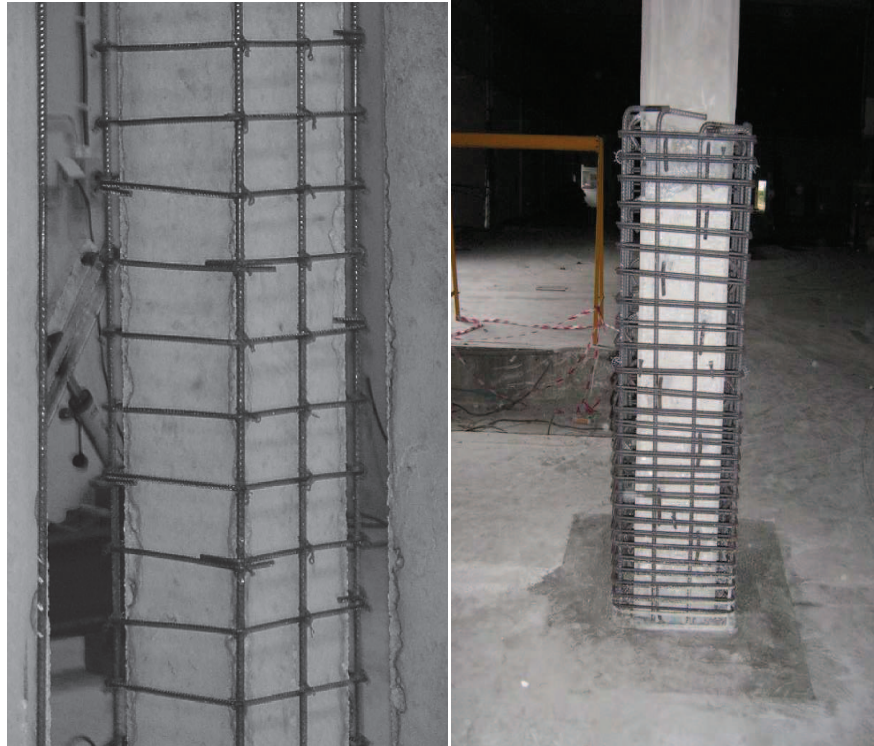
Typical concrete jacketing of reinforce concrete columns
